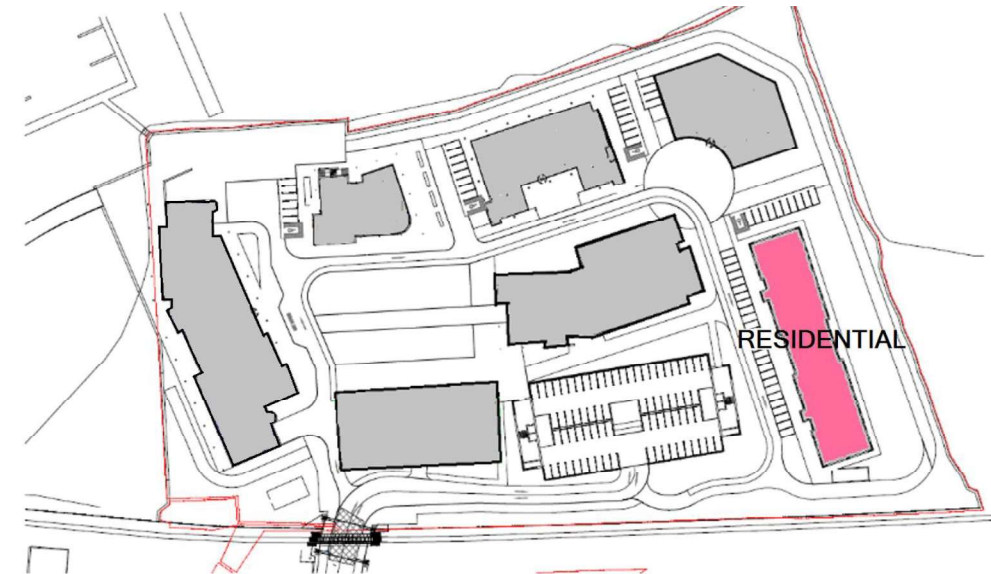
Site Key Plan Indicating the Residential Building Locations
